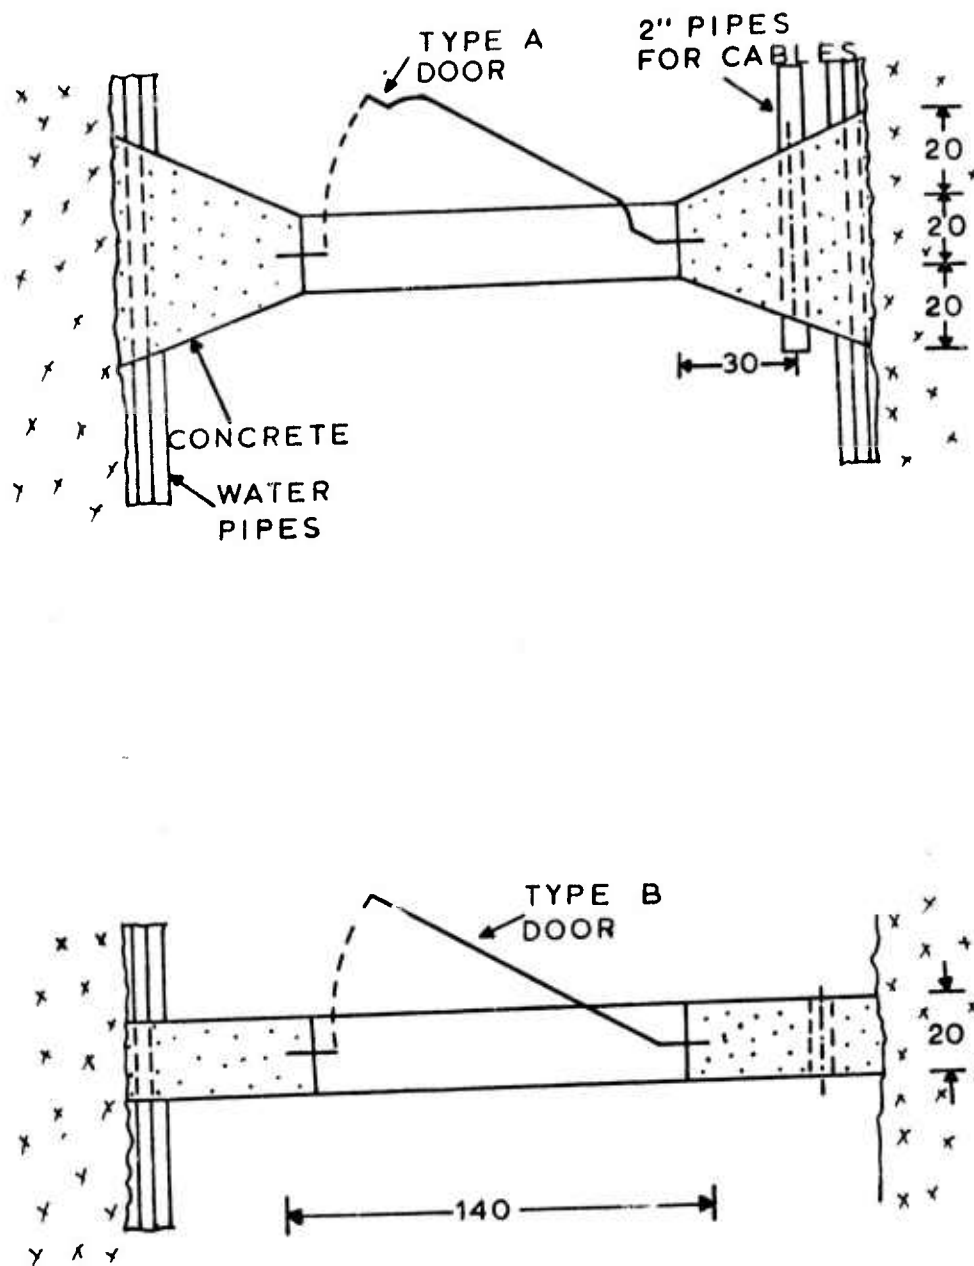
Bulkhead ship door (type A) and flat door (type B), as installed in ZLP tunnel. The shape of concrete mounting distinguish both types in fig. 1.
